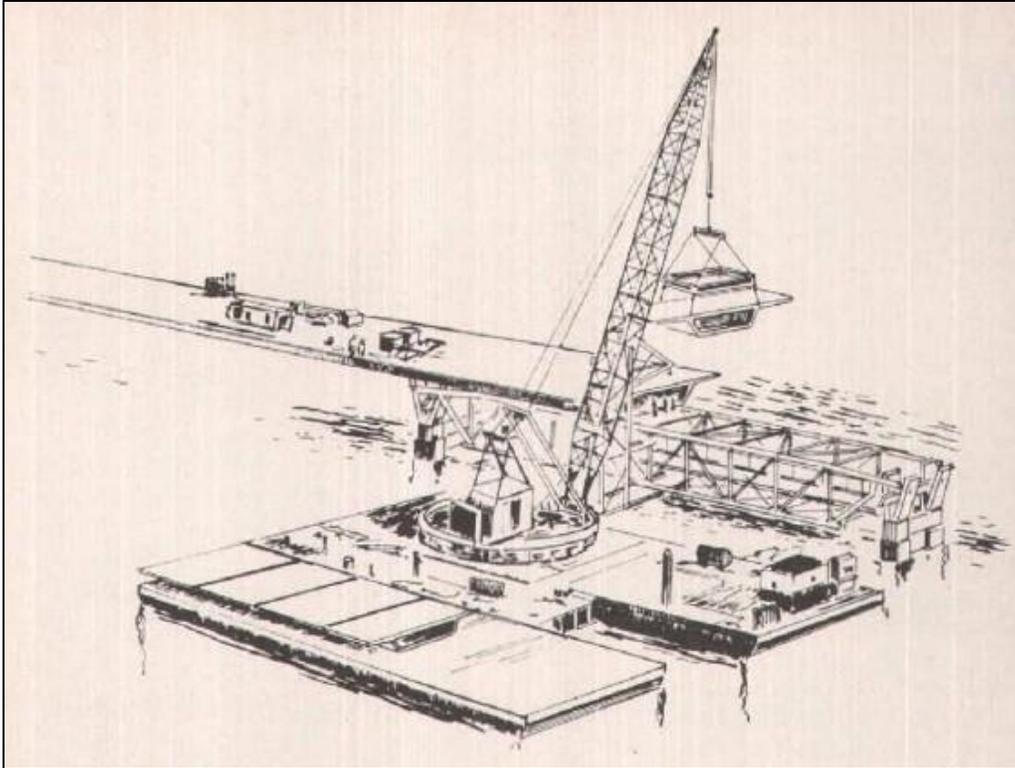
Artist rendering of span-by-span segmental construction methodology to be used on the Long Key bridge.
